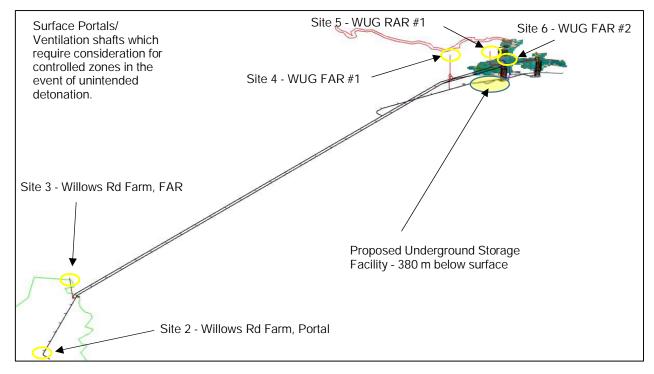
Underground storage facility location in relation to surface connections (Site 1 in Waihi not pictured) (source: GSS, 2021)
